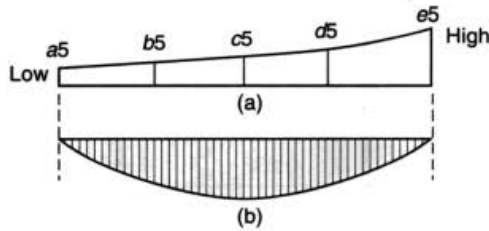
Design of edge beam: (a) Loading on edge beam is due to dead load of beam + live load on beam + vertical component of N_y on beam. (Horizontal component to be taken separately), and (b) Bending moment diagram due to vertical loads.
